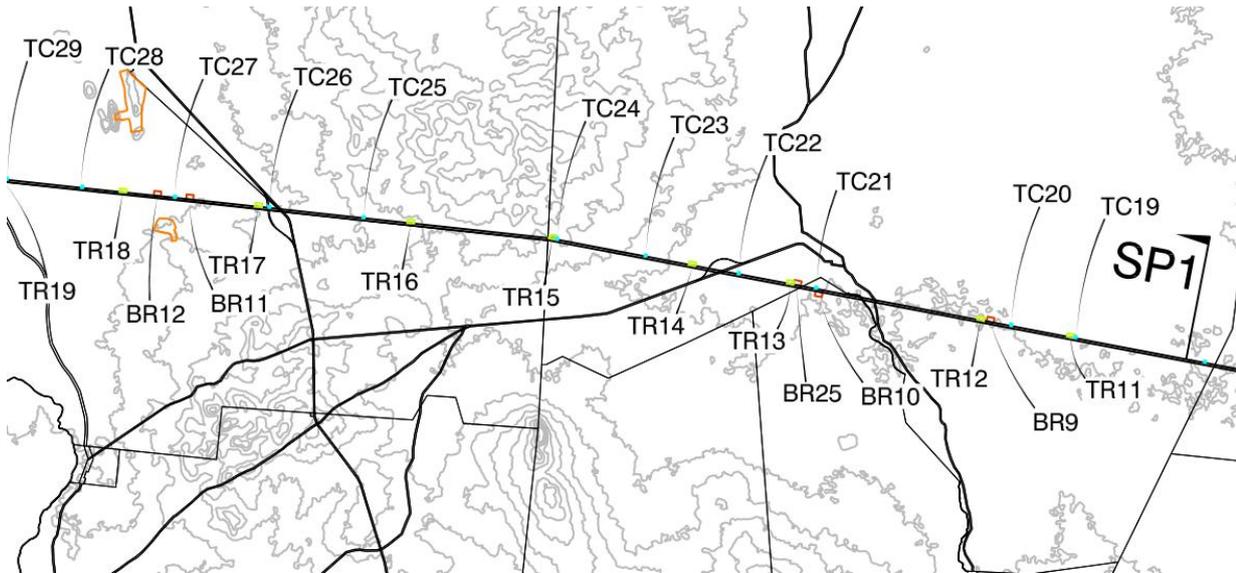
Plan showing proposed location of Laydown Areas (eastern half of SP1)
